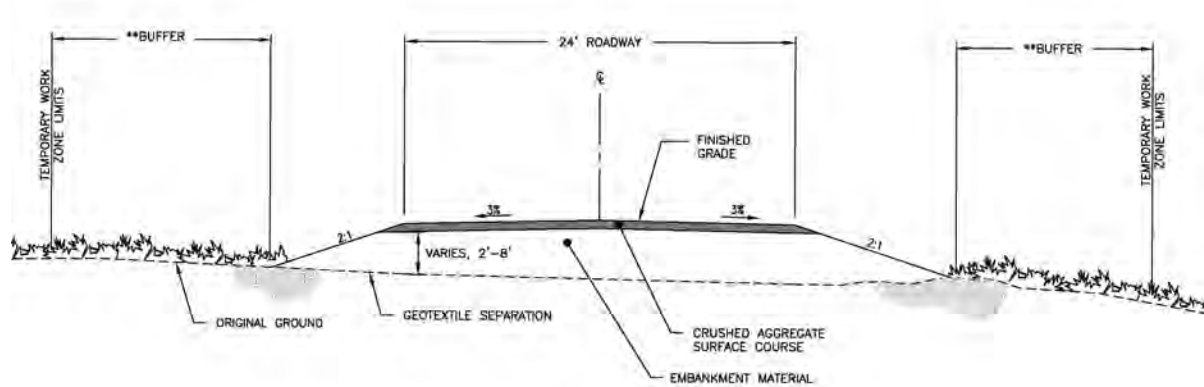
Typical Permanent Material Source Spur Road Cross Section
